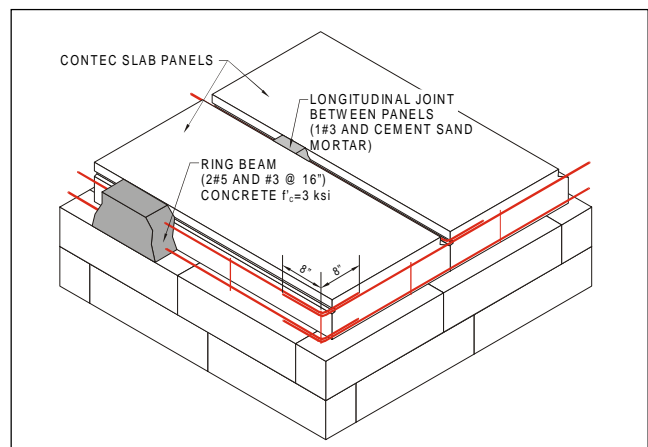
Typical reinforcement for ring beams and longitudinal joints.
